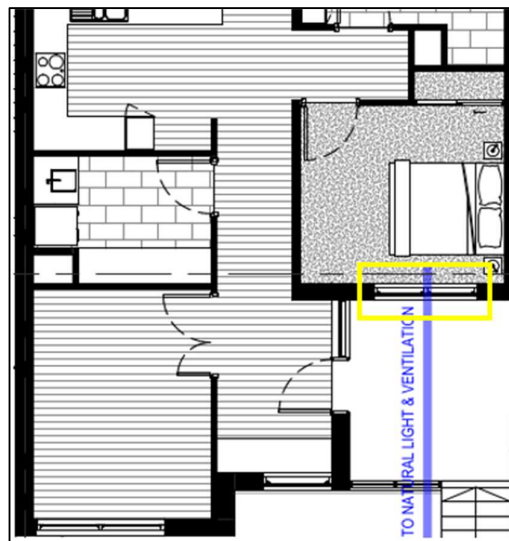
Extract of Building E plan with example of window to corridor highlighted yellow
